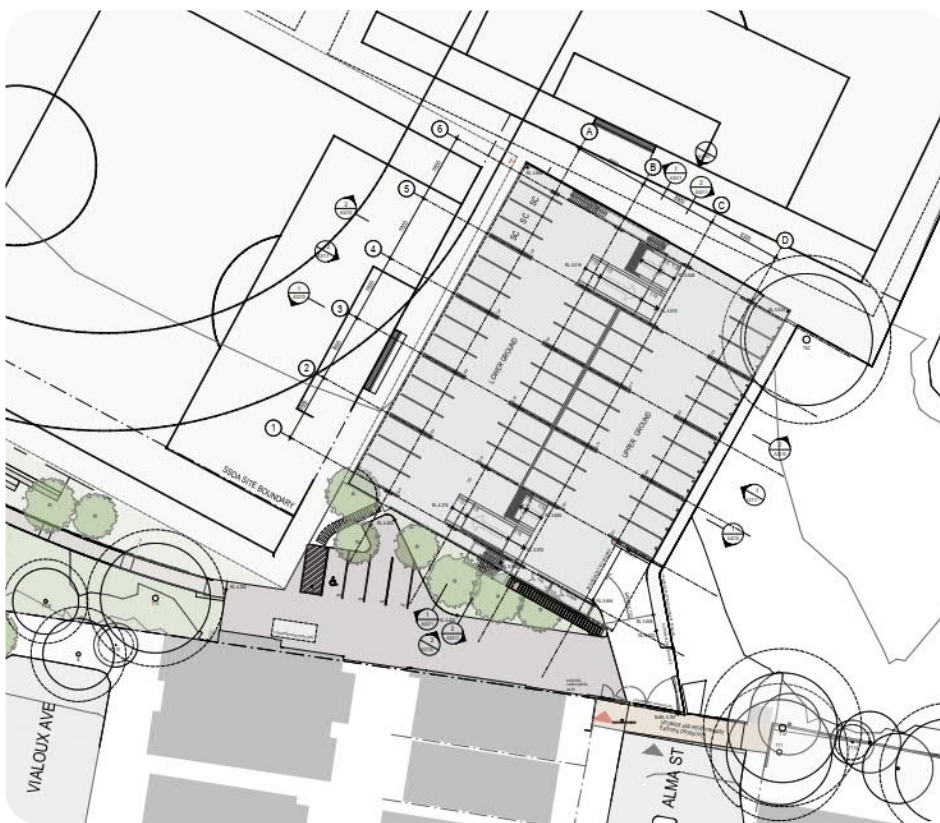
Building 2 - Ground Floor General Arrangement - Alan Jack and Cottier Architects
